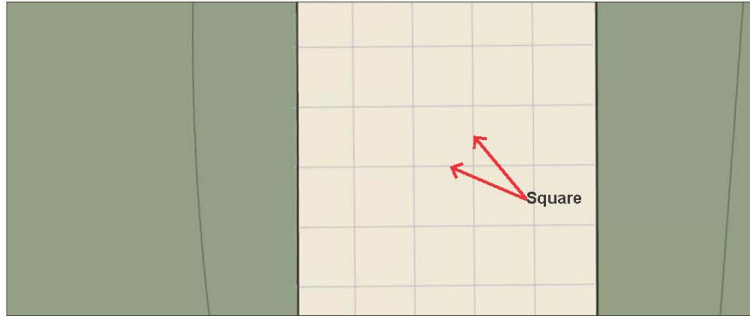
Sidewalk and crosswalk scoring detail plan
